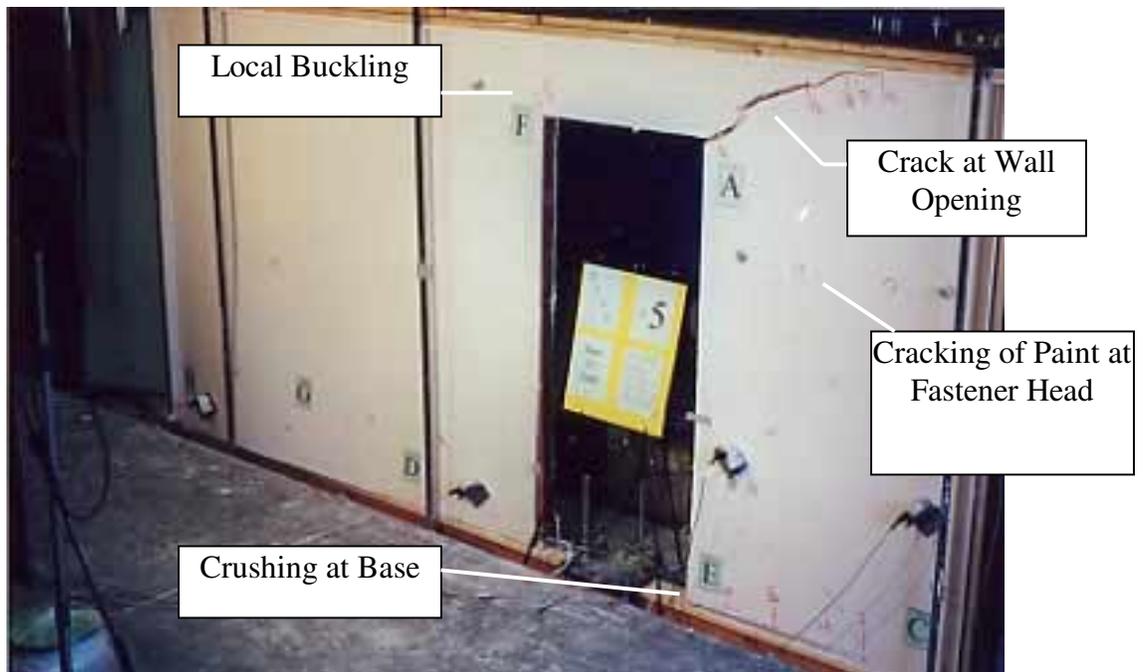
Photograph of Wall Specimen S16MAF at 2% Drift
